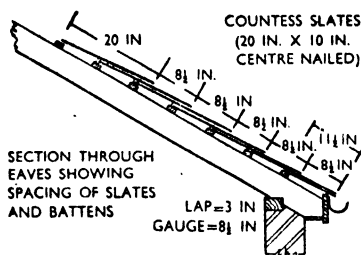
Roof covering of "Countess" slates. Centre nailing is recommended for all slating. The minimum lap which should be used is 3 in. and the maximum gauge or margin should be $8\frac{1}{2}$ in. Note the double course at eaves.
